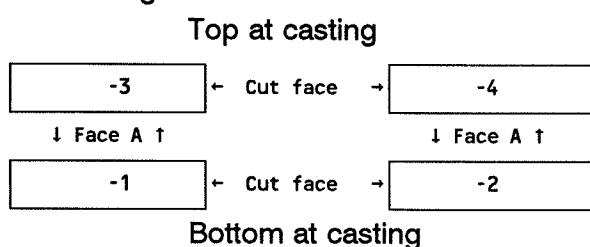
Elevation of concrete prism. Sketch showing the division of one prism into specimens after cutting. The given numbering shall be used.
